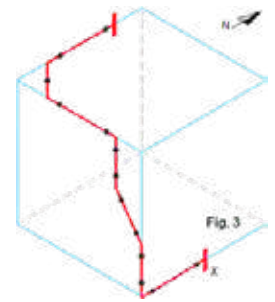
shows a pipe spool that runs through three planes. There is a bow (rolling) in one plane 45° towards West.
